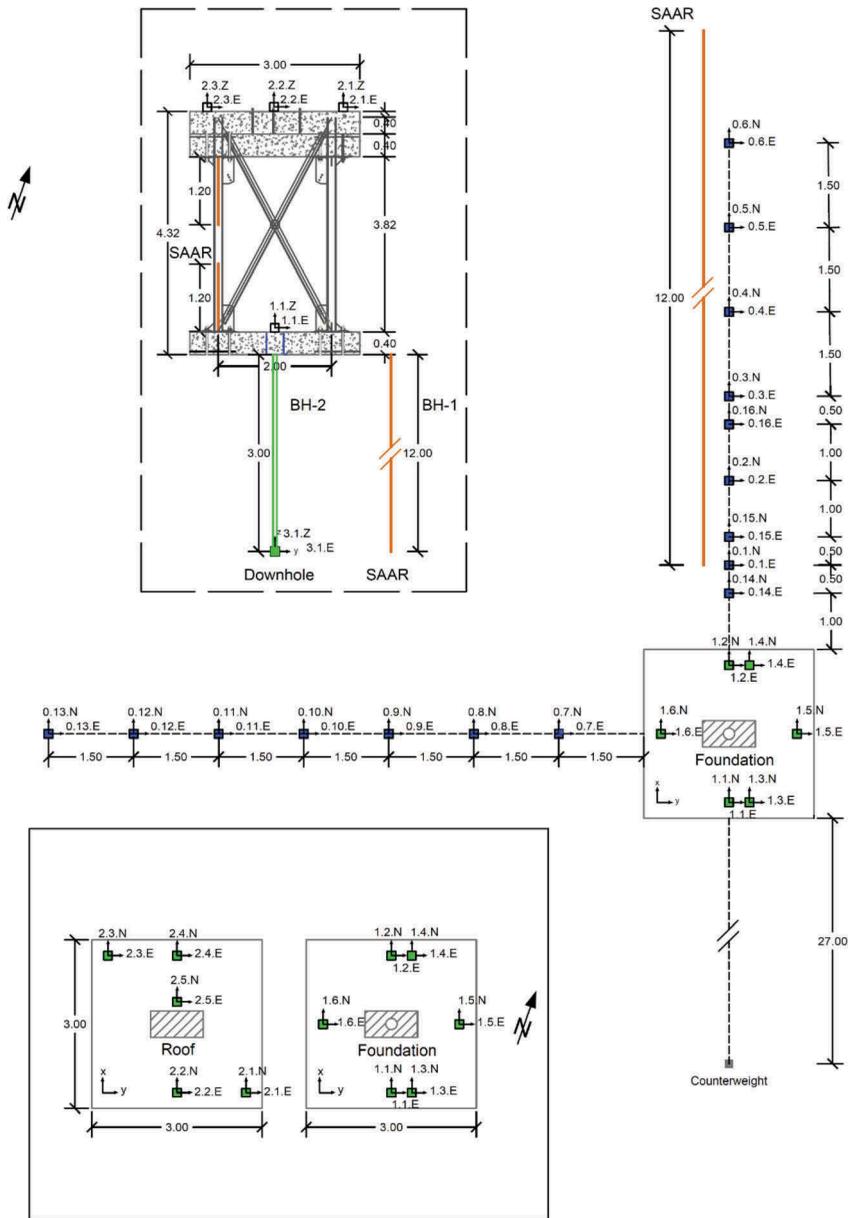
Instrumentation layout of EuroProteas experimental campaign.
